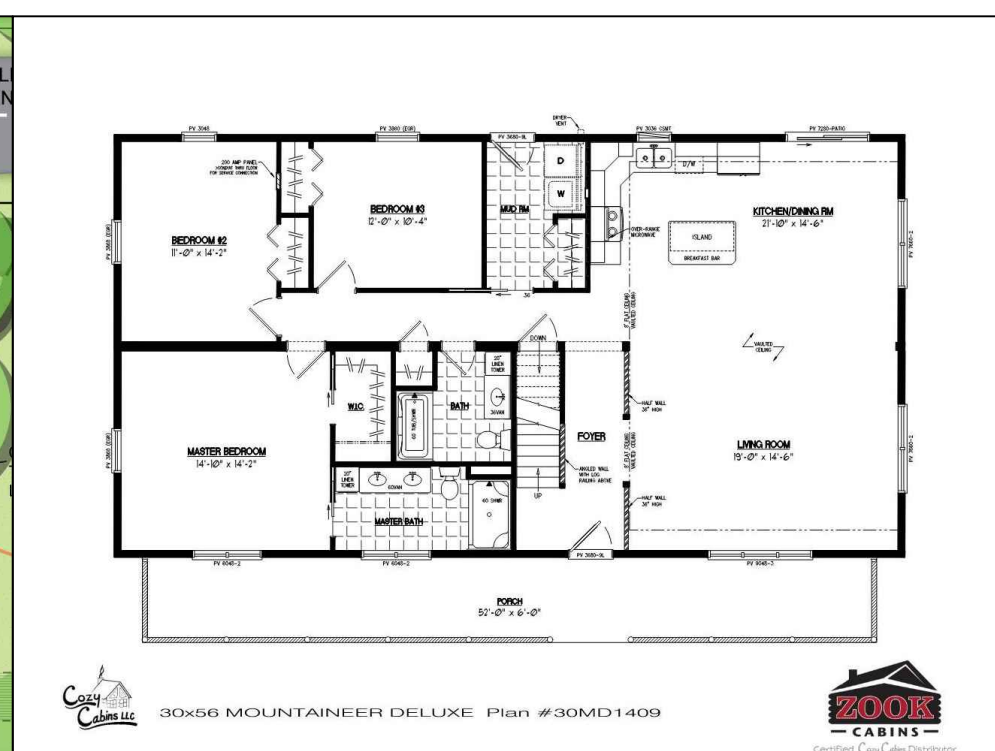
ZOOK "MOUNTAINEER DELUXE" CABIN FLOOR PLAN
